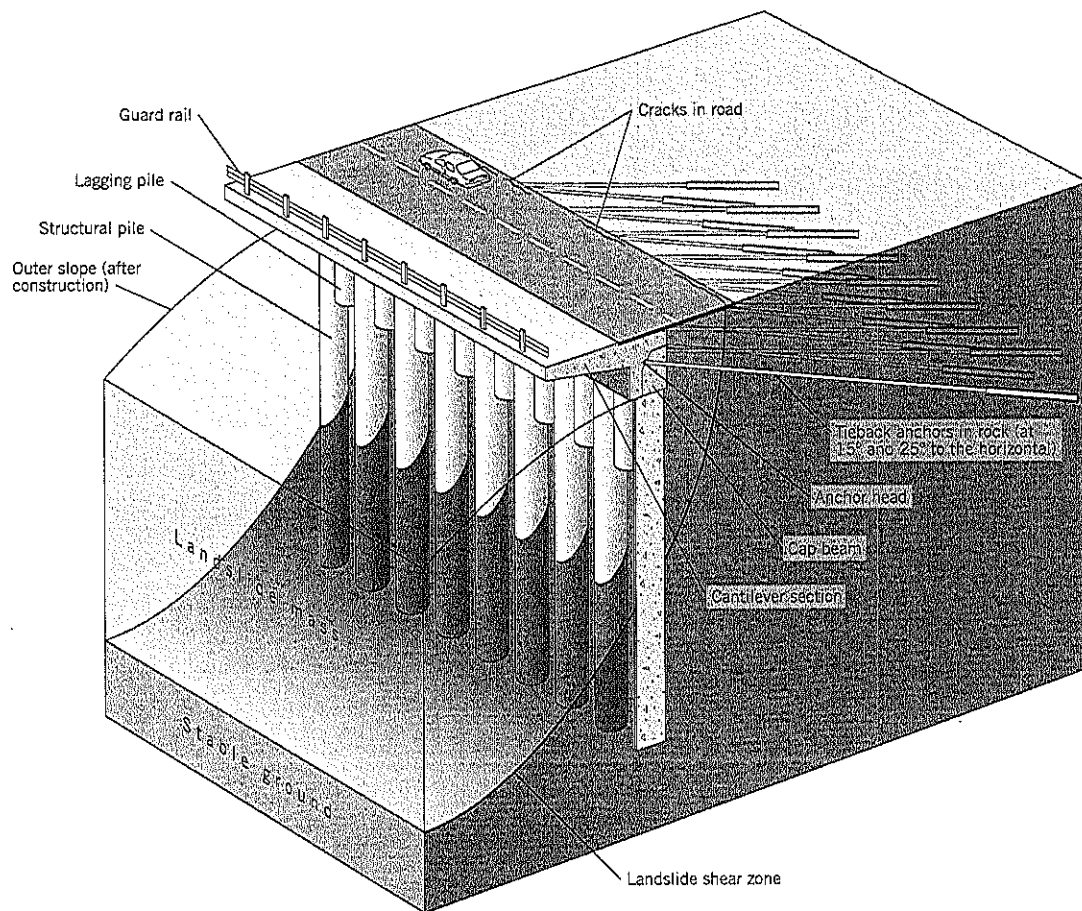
Goat Lick Slide. Three-dimensional block drawing showing the shear piles, lagging piles, and tieback anchors in relation to the landslide.
